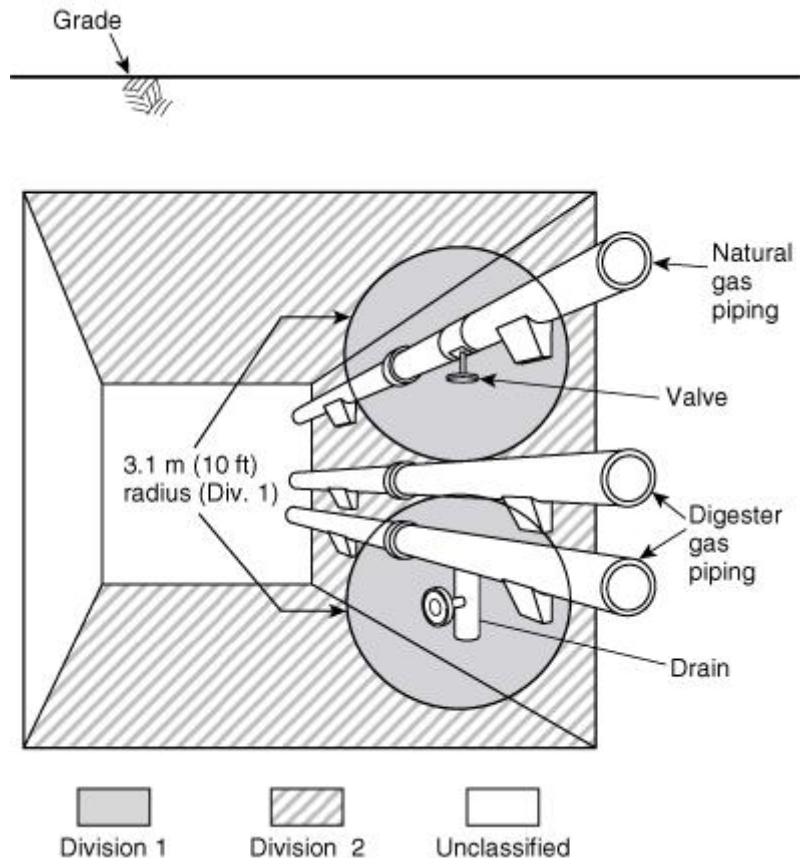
(f) Underground Tunnel Containing Natural Gas or Sludge Gas Piping and Using Ventilation Method (D); Illustration of Table 6.2(a), Rows 20a and 20b.
